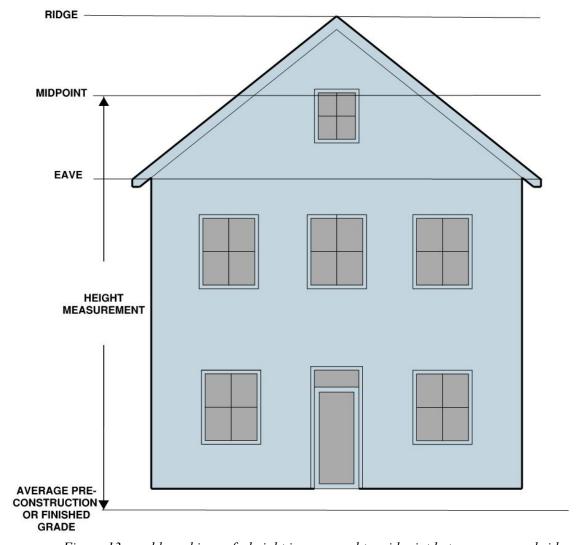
gable or hip roof - height is measured to midpoint between eave and ridge.
